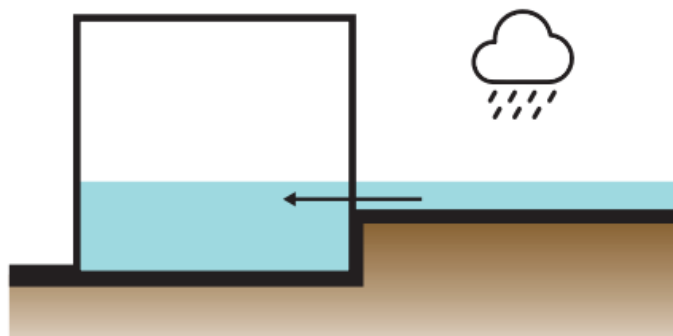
Sketch drawing shows the idea of water overflowing into rooms from elevated yards. Source (AICS 2021).
